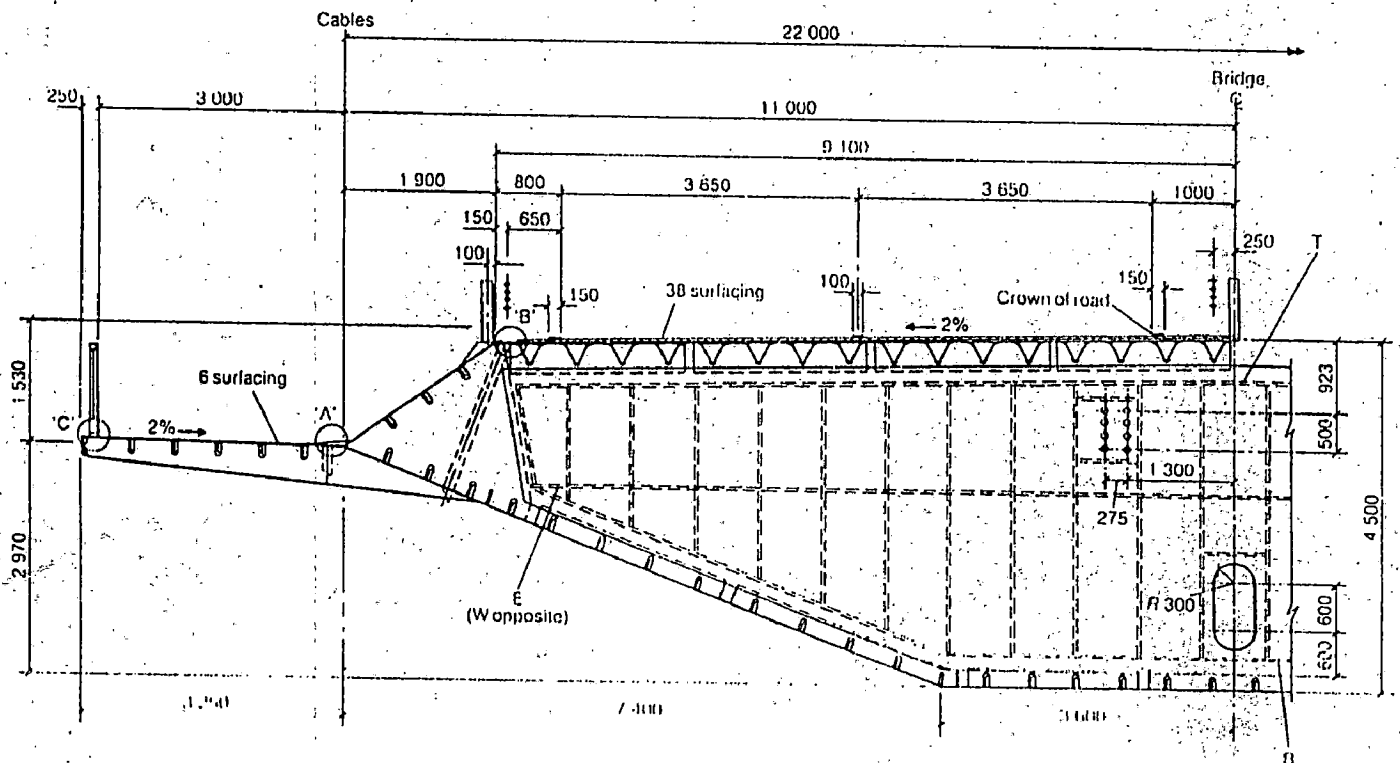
Typical box-girder showing accelerometer positions B, T, E and W
